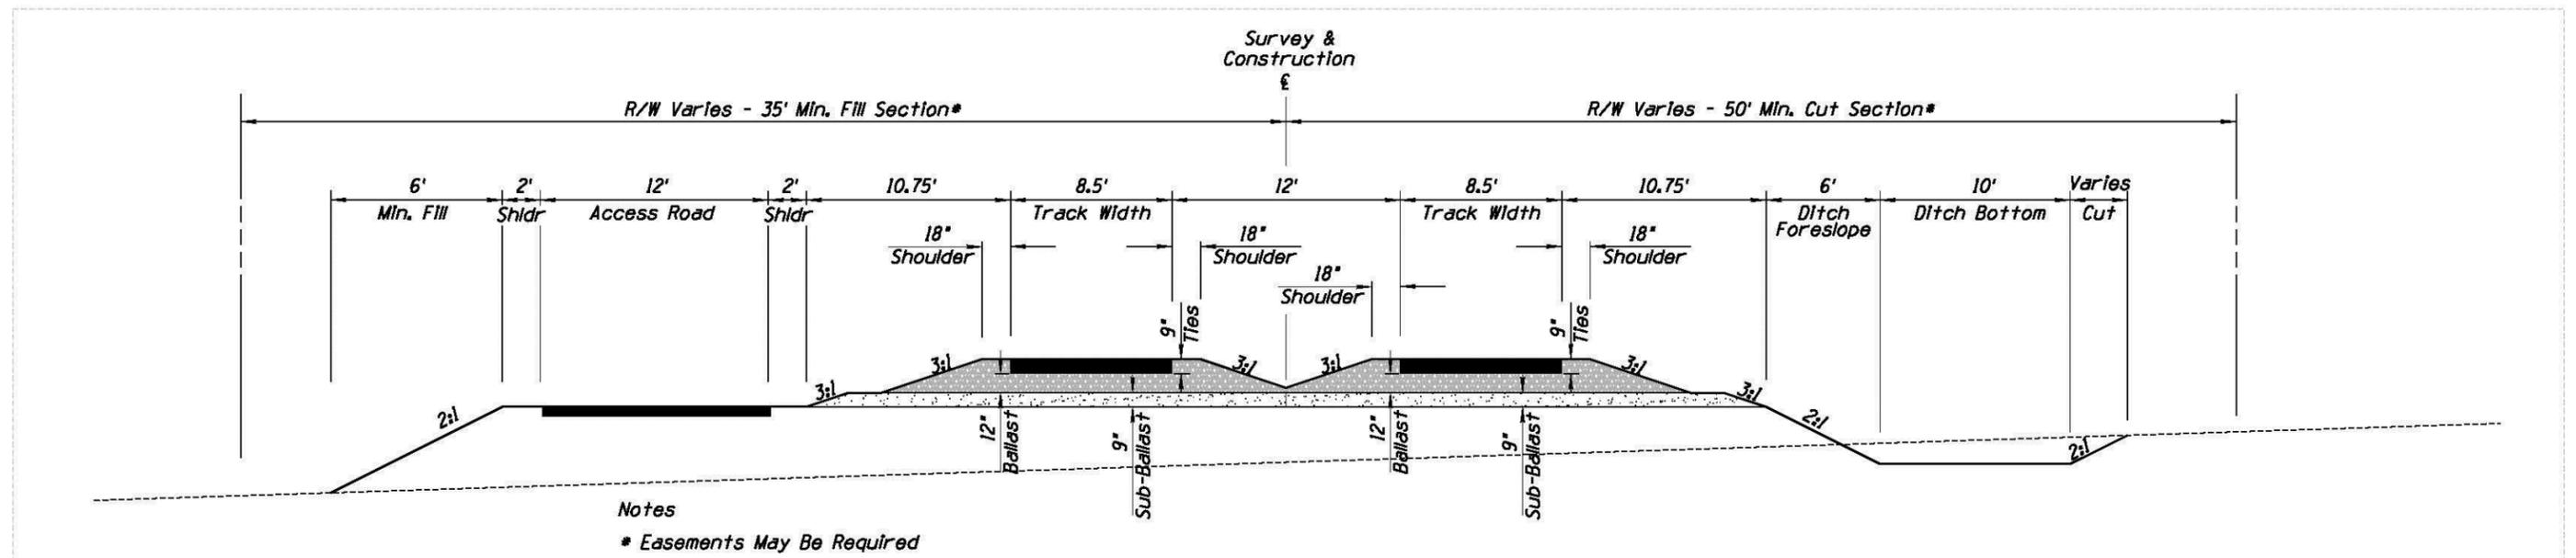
ROW Typical Cross-section (double-track/siding) with Access Road
